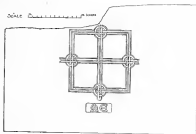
Plan and Exterior Elevation of Window in Refectory.
